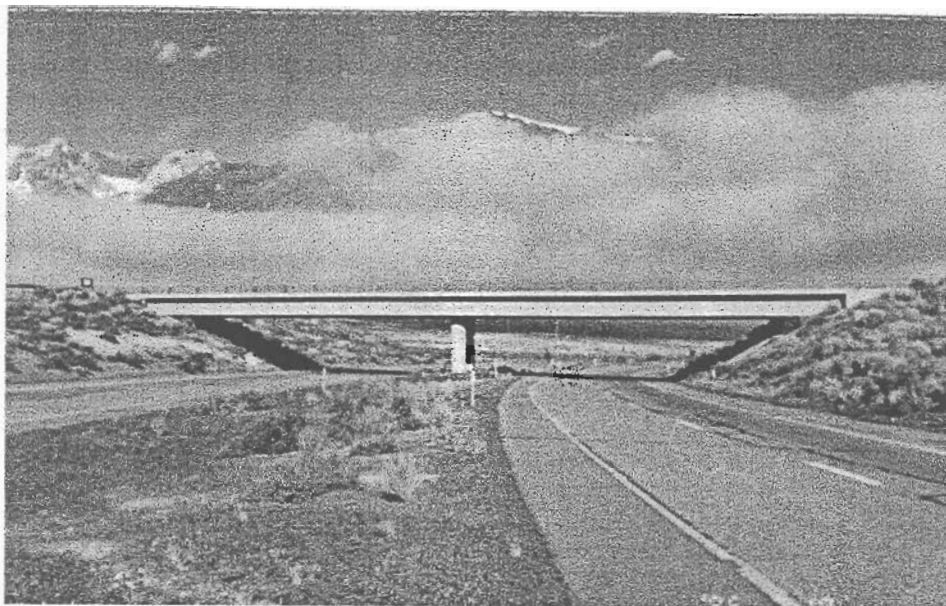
Picture of the Highway 395 Bridge near Lake Crowley. The bridge is a two-span, 203 feet long concrete box girder structure with a two-column bent.
